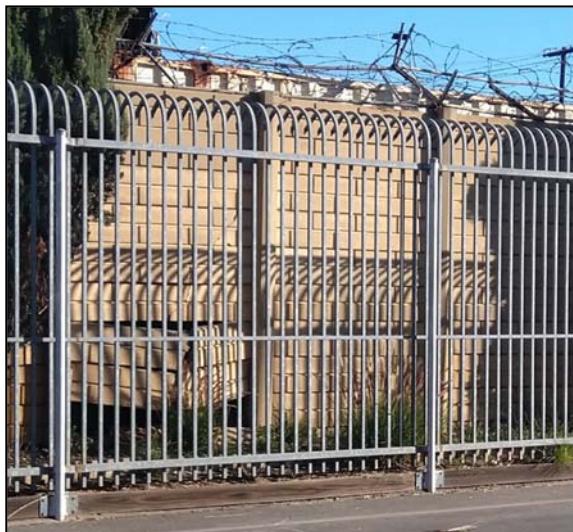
Faux-Masonry Wall along Southern Boundary of Atlas Property
